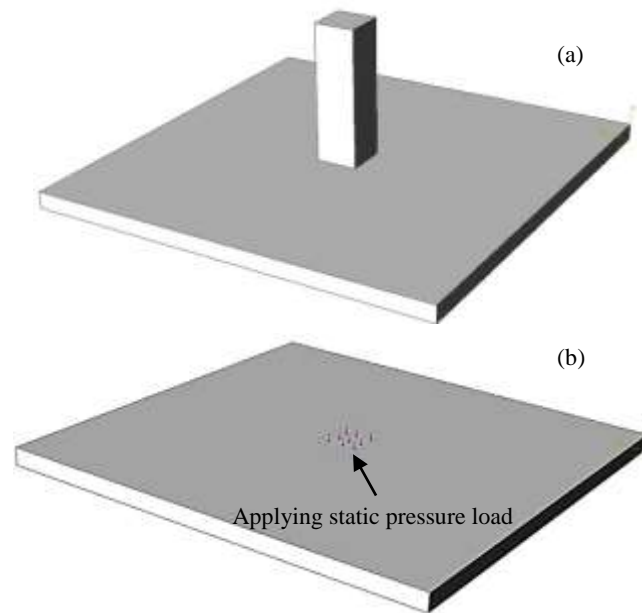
Using a column (a) for applying the static load to the concrete slab equal to column dimensions (b)
